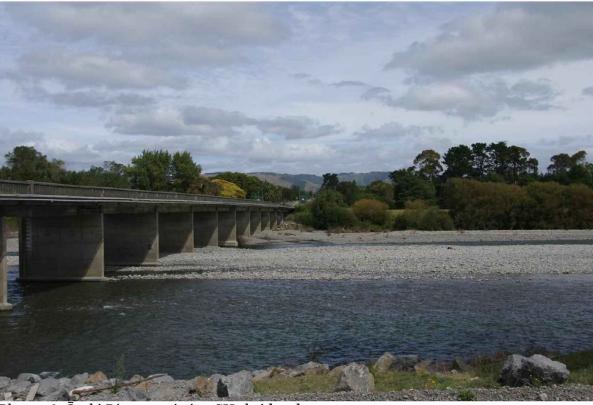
Ōtaki River — existing SH1 bridge downstream (Looking south – Downstream rest area partially visible on south bank)
